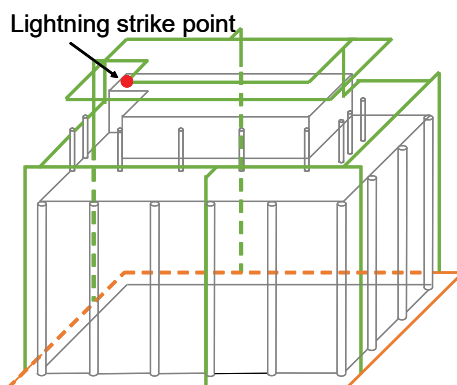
Calculated external lightning protection system (In case external LPS isolated from building structure) [25].
